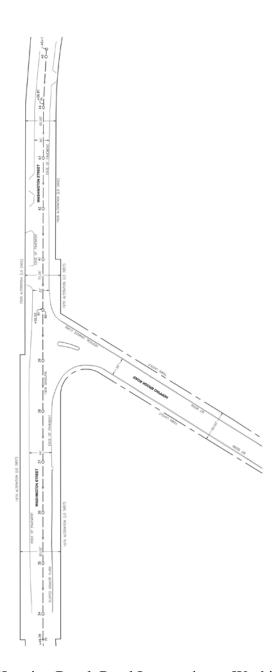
Planimetric Layout of the Hopping Brook Road Intersection at Washington Street
